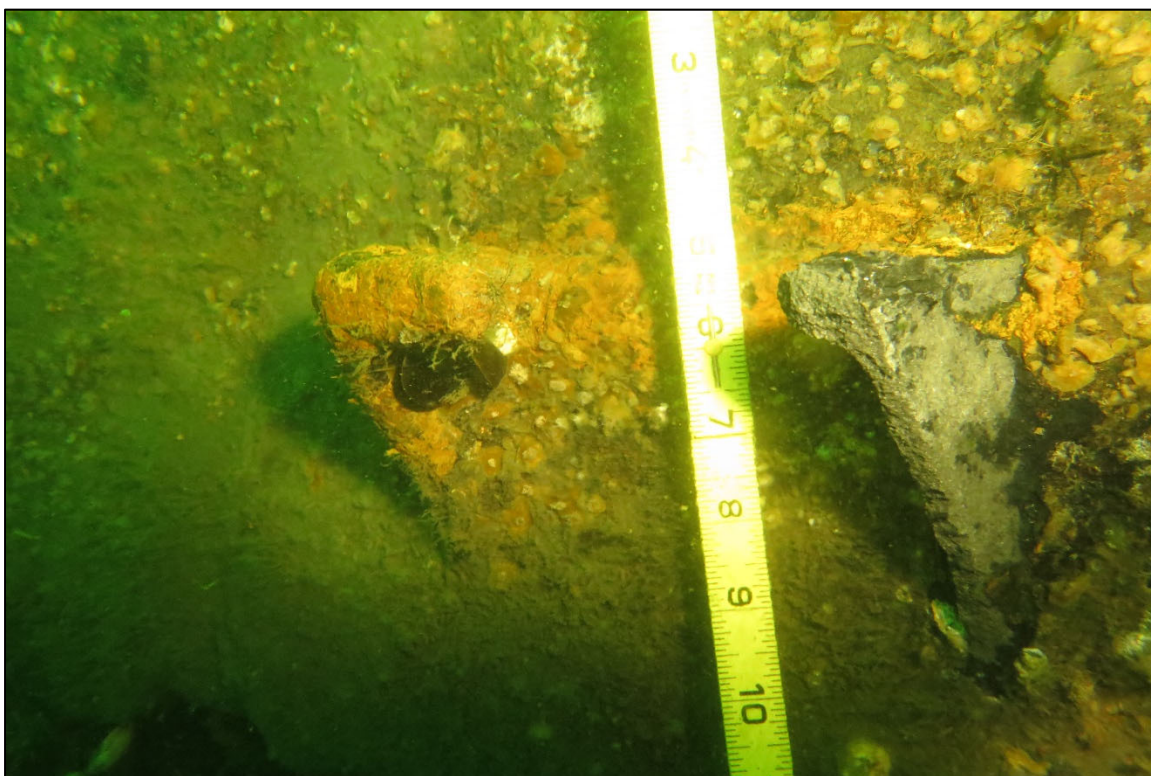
Typical Severe Corrosion at Failed Anchor Bracket W1 on Cleanout Chamber Cover.
